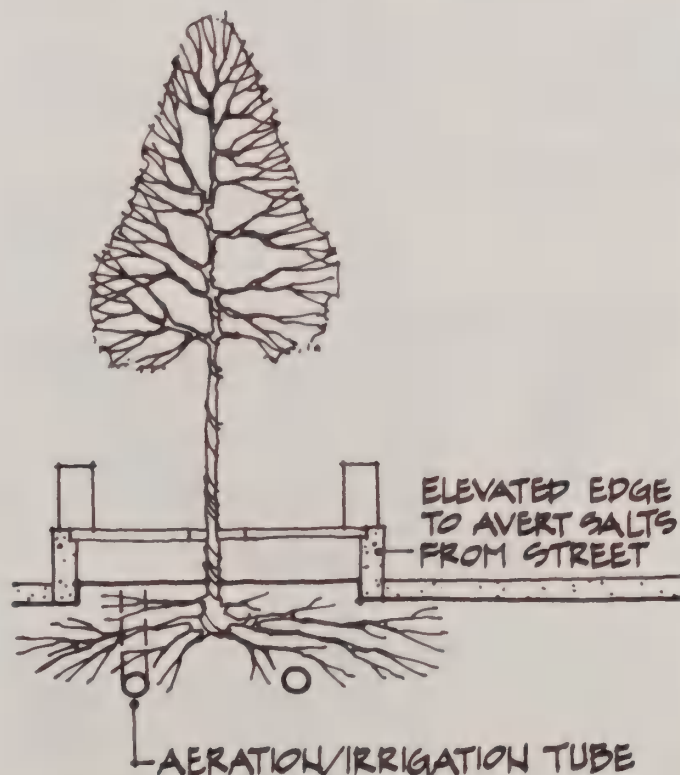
Planting Pits with Perforated Irrigation Tubes
